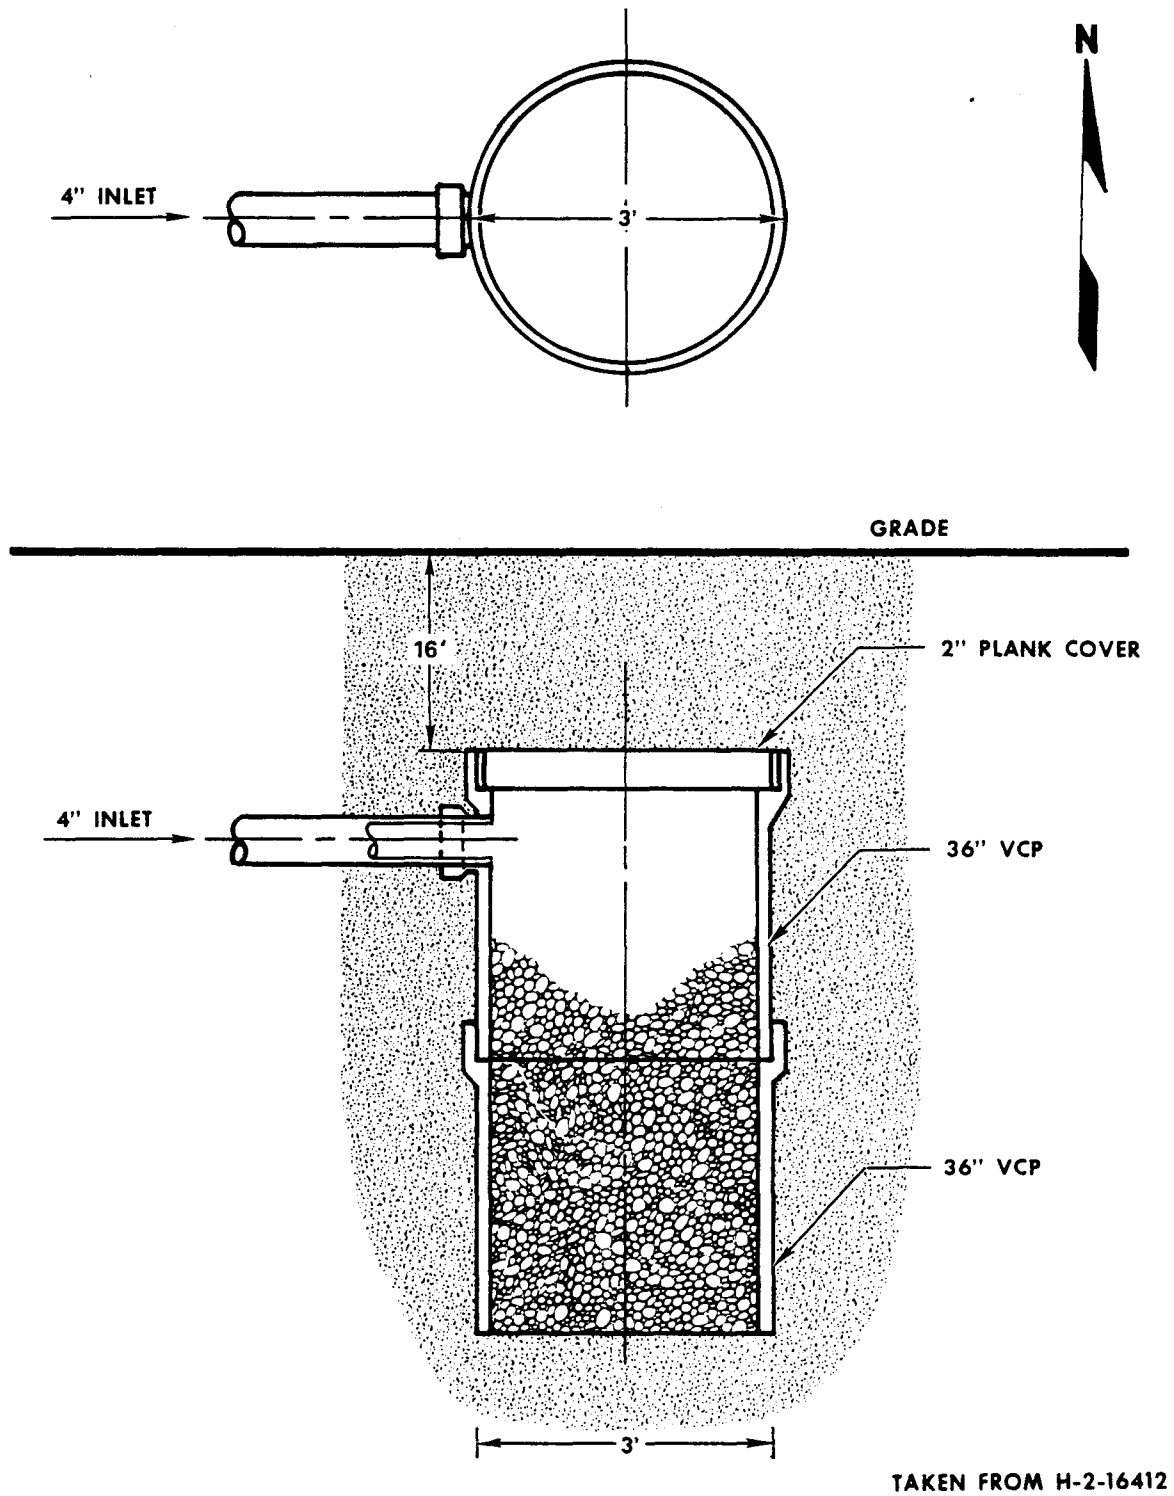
216-Z-15 French Drain Plan and Section.(D)
